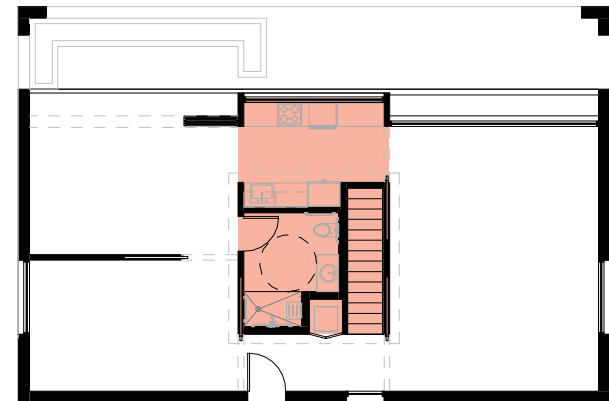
c. Typical level 1 floor plan of a detached housing typology.
